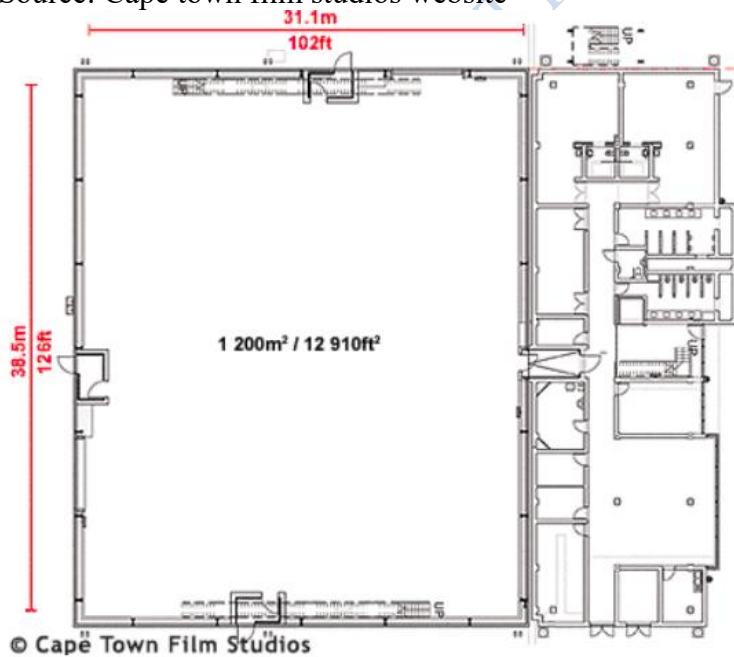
showing stage 3 plan of Cape Town film studio
